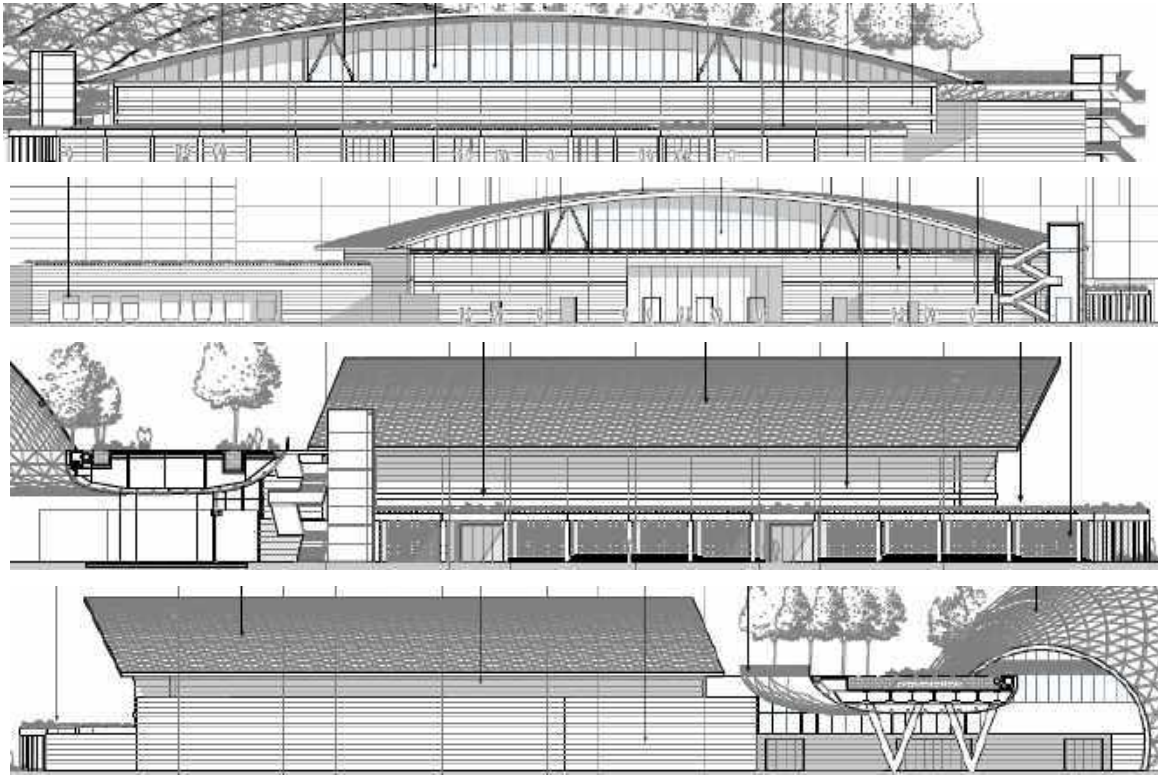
Illustration of the event building façades. Top to bottom: the southeast, northwest, northeast, and southwest façades.
